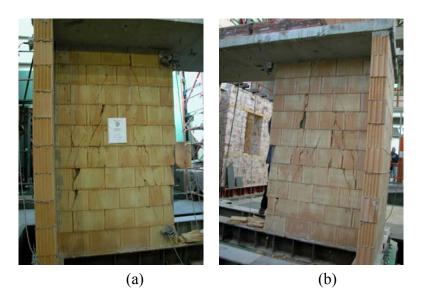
Specimen B3: Test 0.26g: Cracking through the height of 1st horizontal wall, partial collapse (a) front view, (b) back view.
